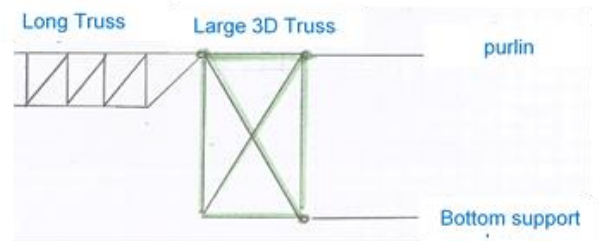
(b) Location of the attachment of the truss to the 3D truss
